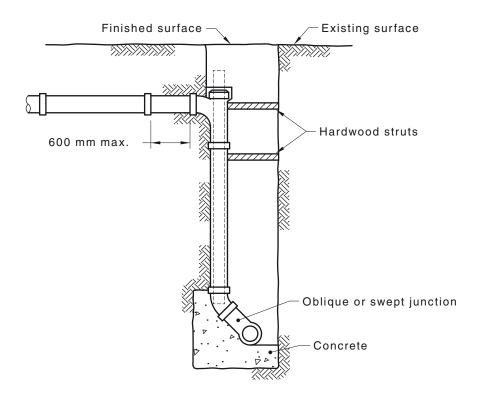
VERTICAL JUMP-UP TO BRANCH SITE STORMWATER DRAIN
